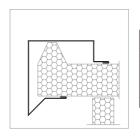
Ob-29 flashing "IzoRoof panel wind beam, type I - overhang"
